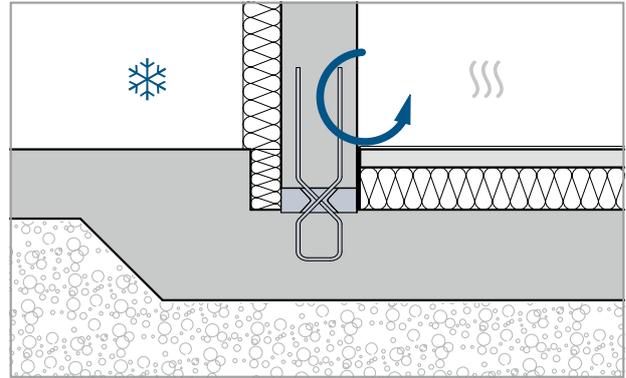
Pos. ①: Heat flow in underground garage wall with Schöck Sconnex® type W
